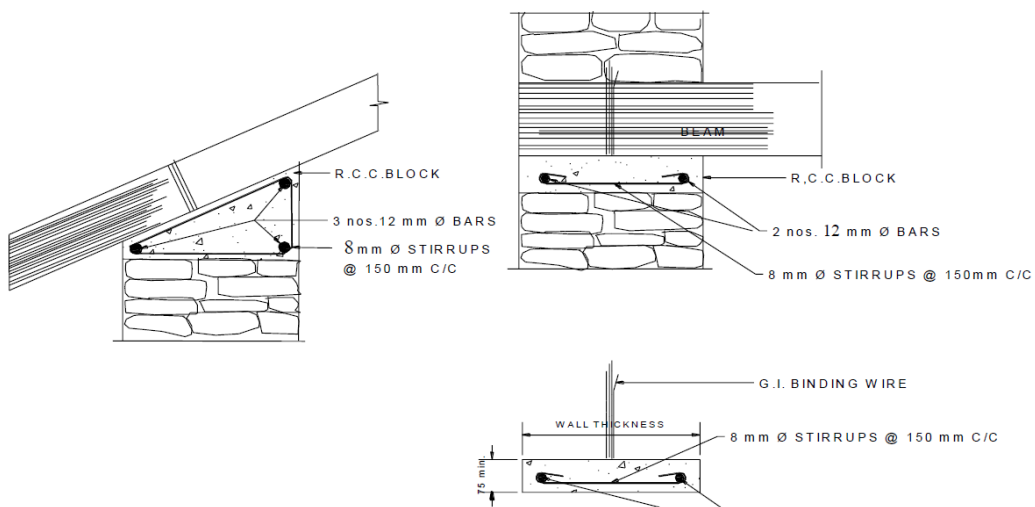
Details of Fixing Joists and Rafters (In areas where steel and cement are available)
